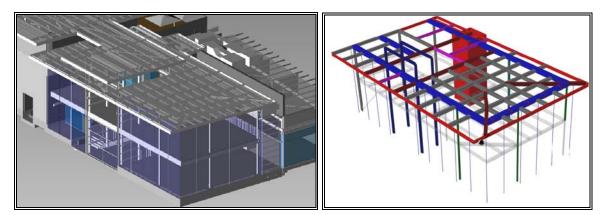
3D model produced in Revit showing roof steelwork grillage
